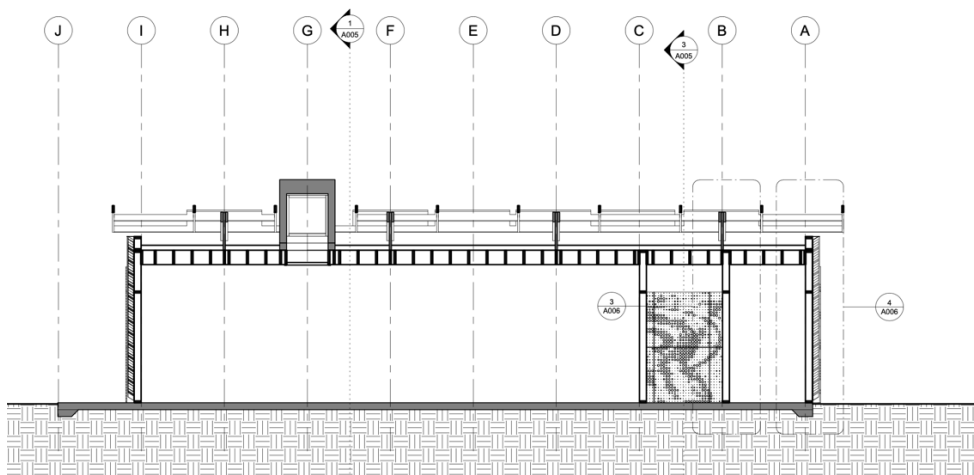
Longitudinal Section: KSU Mini Pavilion with Structural Grid. (Michael Carroll 2022)
